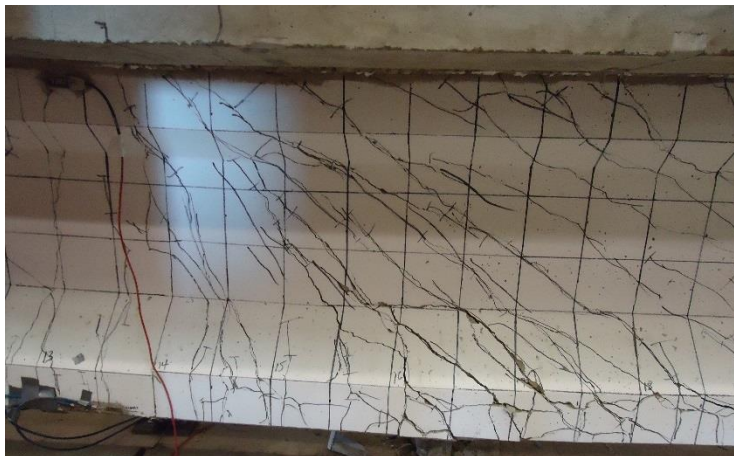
Test C1 failure, note large shear cracks and failure of the bottom flange concrete
